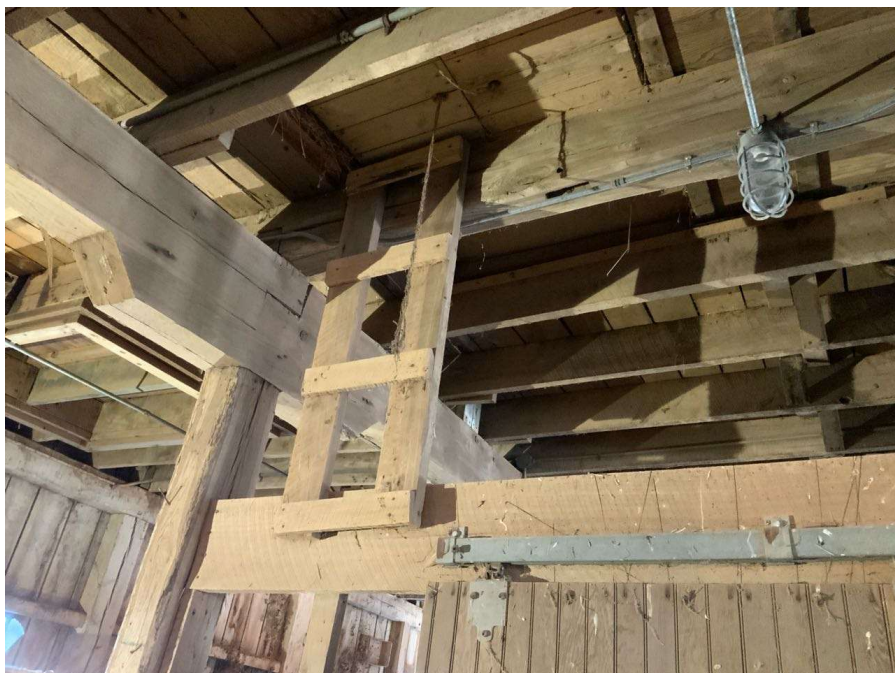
Missing brace at Column Q/2 at grade level. Note the empty mortise slot in the floor beam above. A ladder to a hatch is in the place where the brace should be located.
